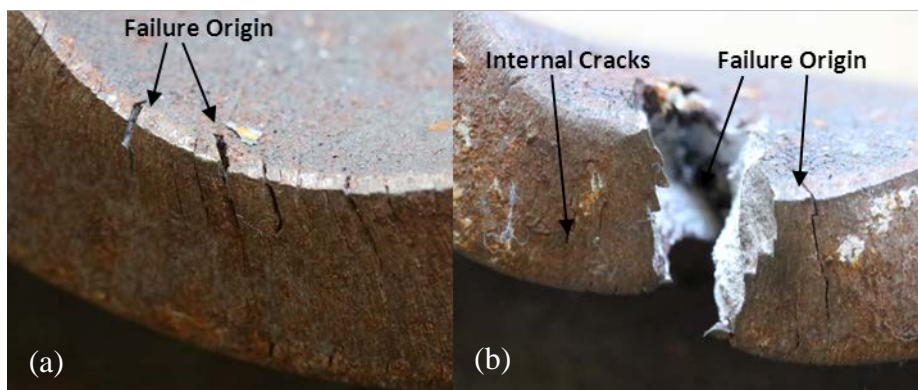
Crack initiation at two different locations on both sides of the bottom flange. Crack and fracture initiation (a) and crack initiation at other side of the flange (b)
